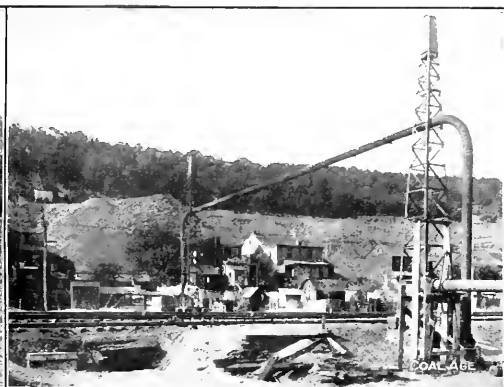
SUSPENSION TOWERS CARRYING PIPE OVER RAILWAY TRACKS
